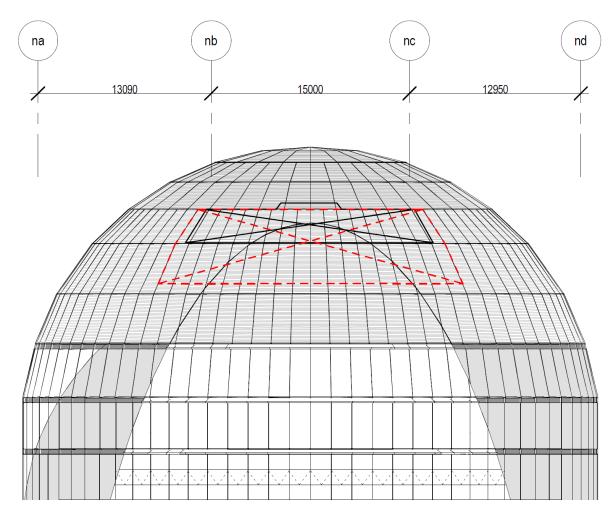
Comparison of approved upper roof BMU openings (outlined red) and proposed reduced BMU openings (outlined in black) – south elevation
